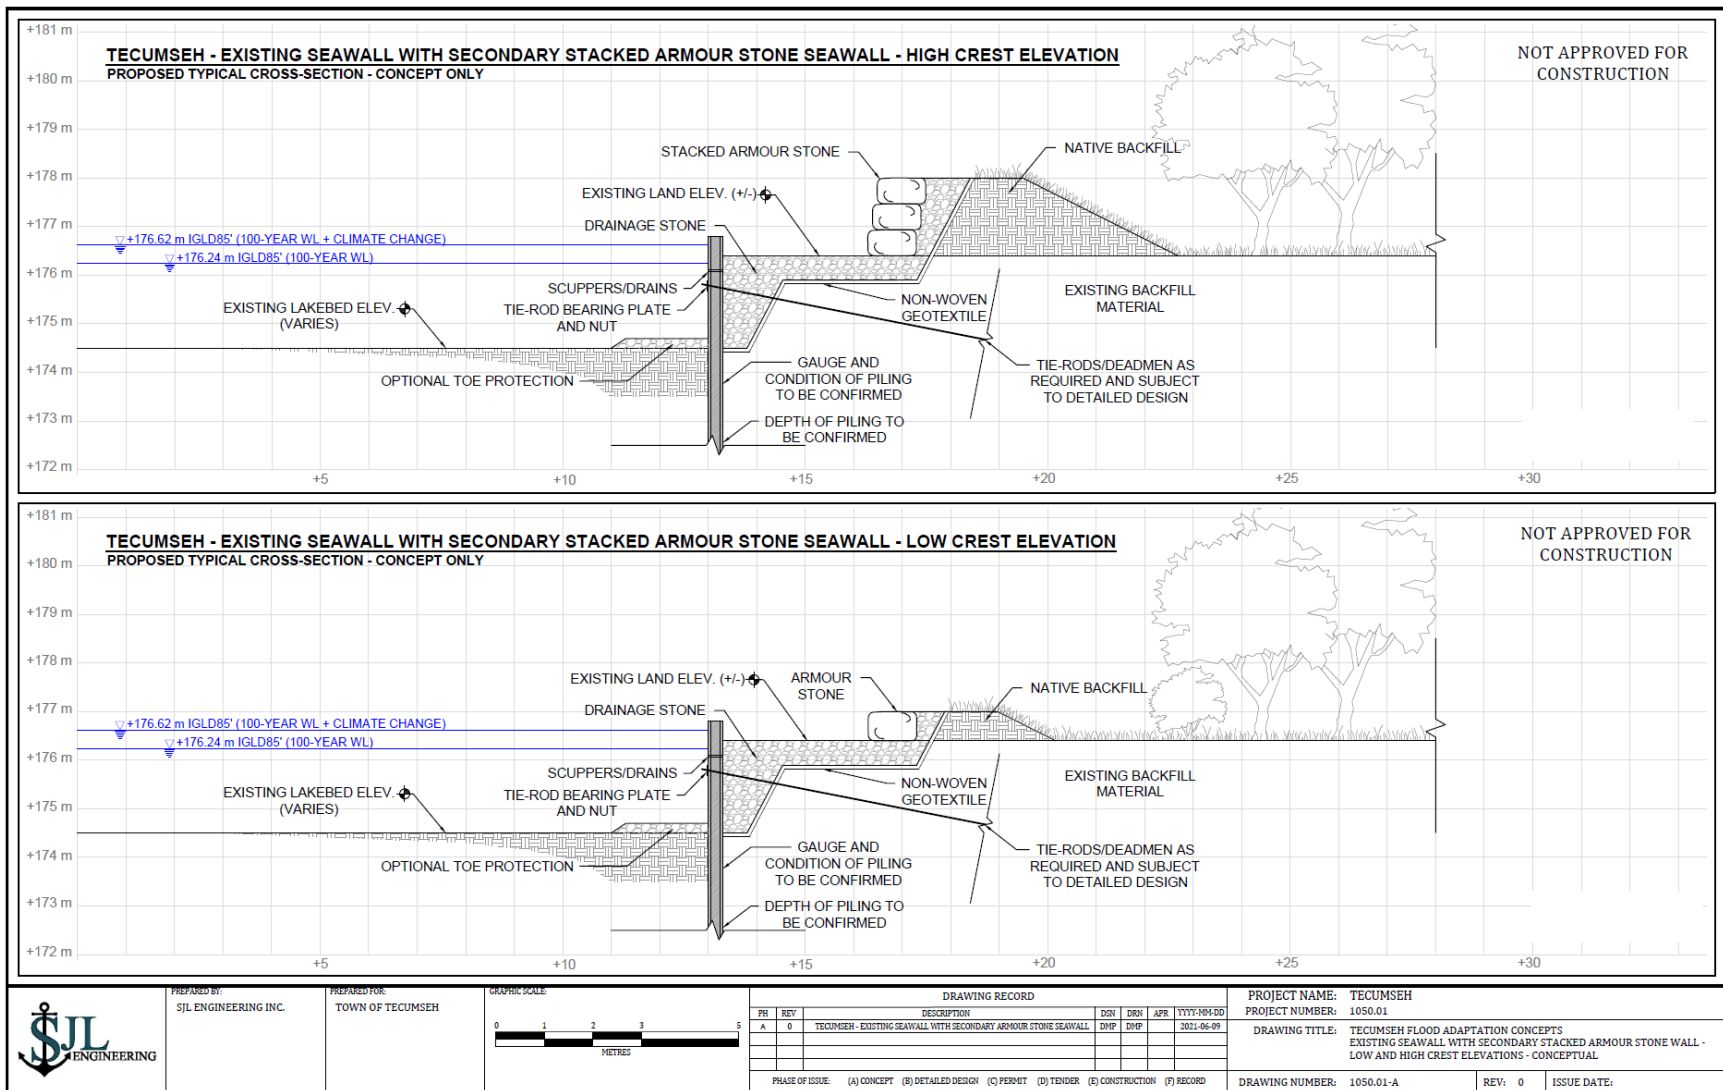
Conceptual Drawing for Secondary Stacked Armour Stone Walls to Reduce Flood Risk
